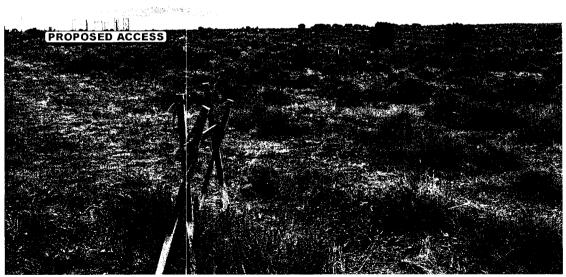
PHOTO: VIEW FROM BEGINNING OF PROPOSED ACCESS
